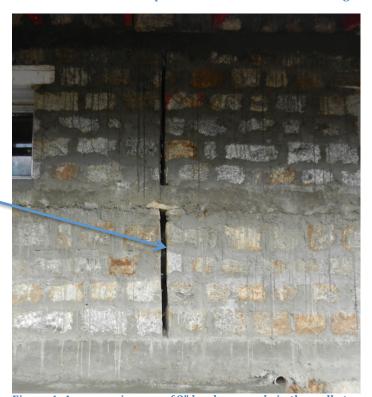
An expansion gap of 2" has been made in the wall at a gap of 12 feet excluding in areas where there are doors. The expansion gap will help in releasing pressure during movements of the building.
